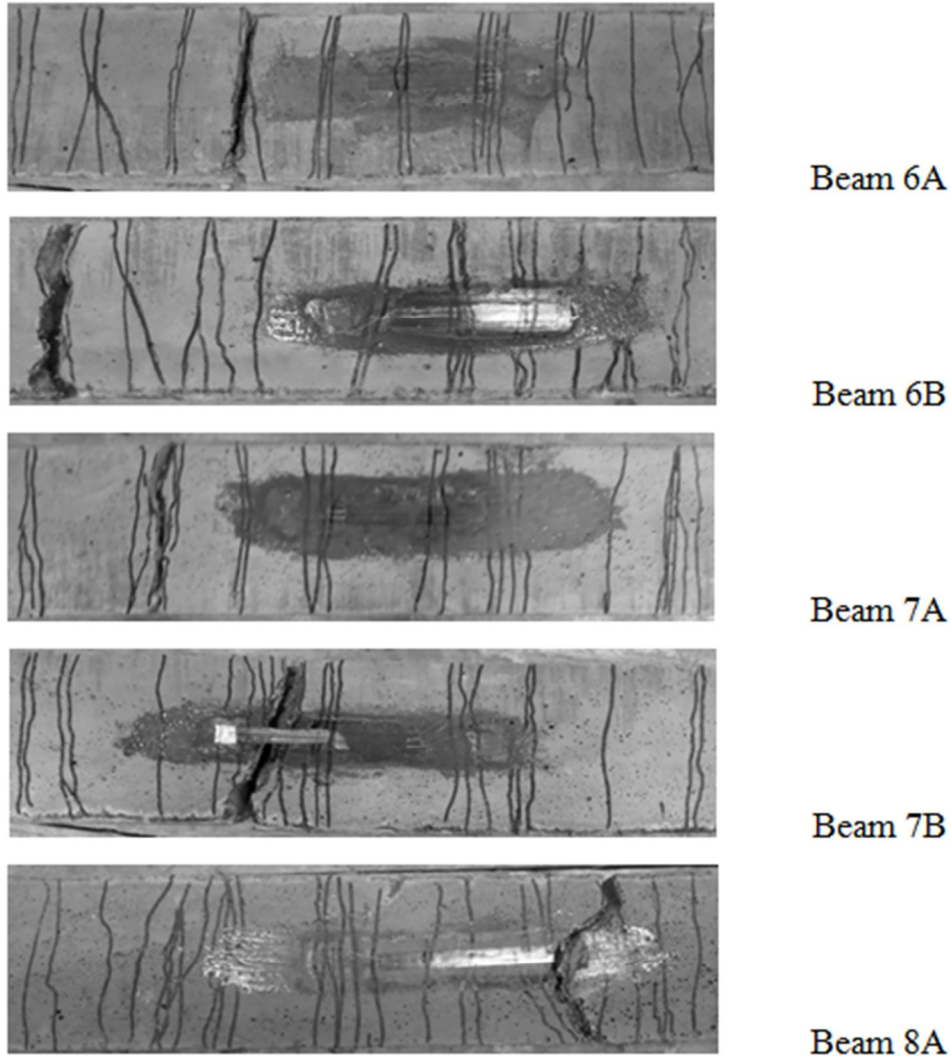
Cracking pattern of beams for final testing of 36-inch beams
